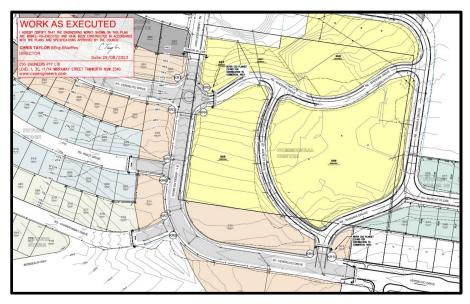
Windmill Hill Estate (Stage 7) - site plan
